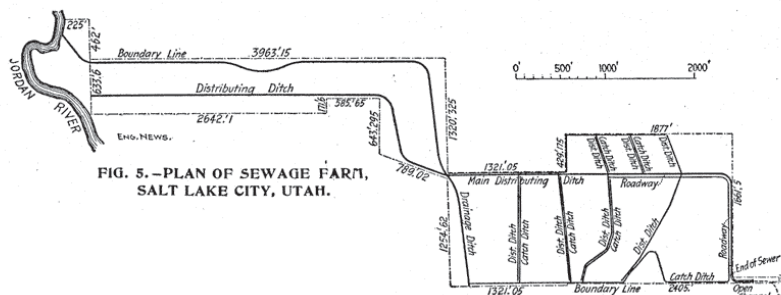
PLAN OF SEWAGE FARM, SALT LAKE CITY, UTAH.
